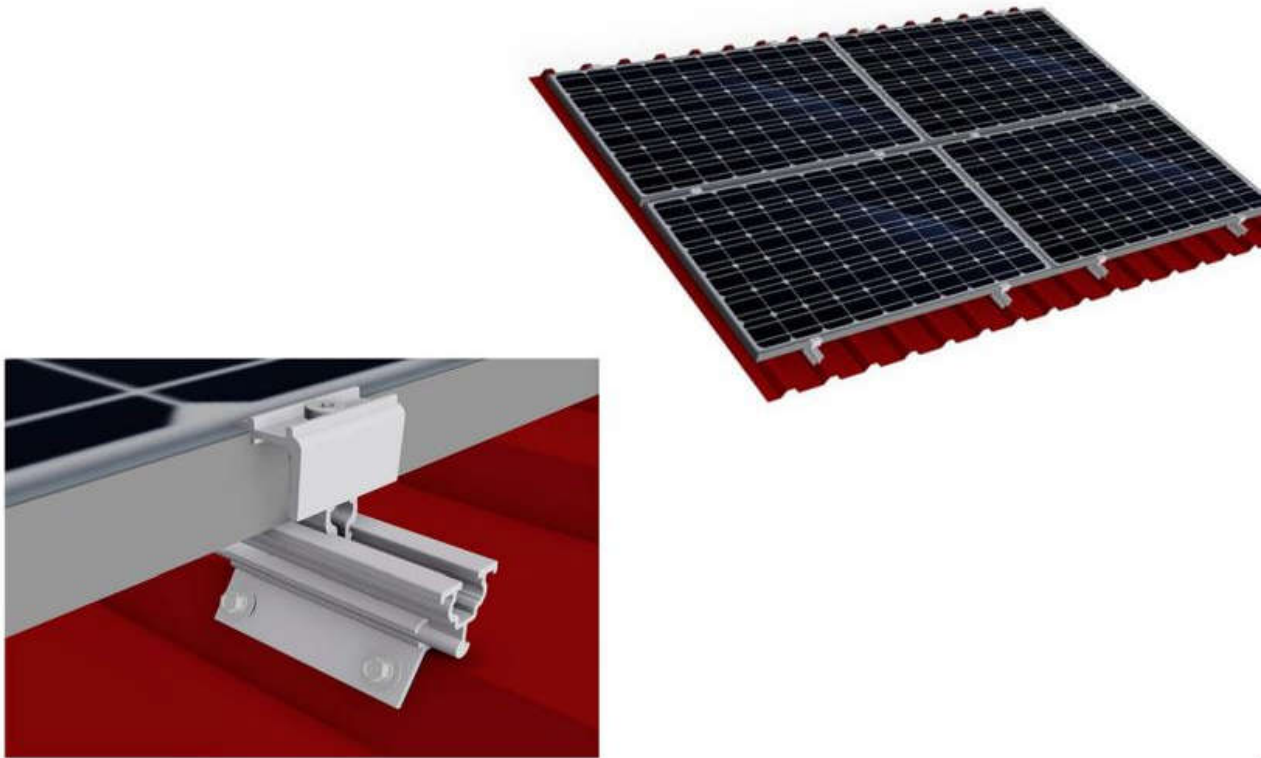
Sketch of the substructure installation on the roof (Source: <https://schletter-group.com/>)
